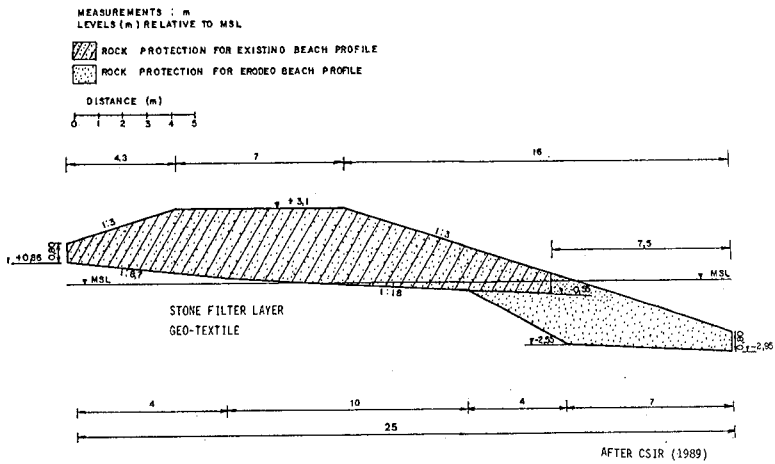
CONCEPTUAL LAYOUT OF ROCK PROTECTION
